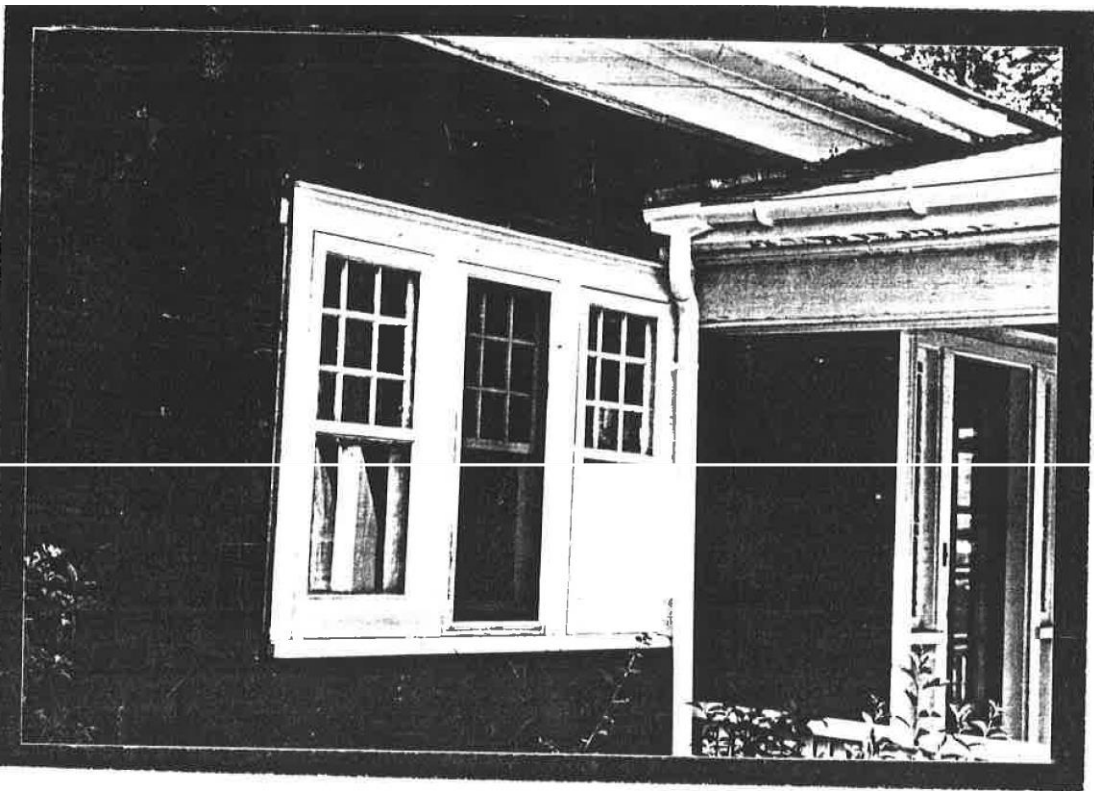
This is a typical window on the Facade (east side) of 16 Mountain Street; the window design is characteristic of the entire house.
